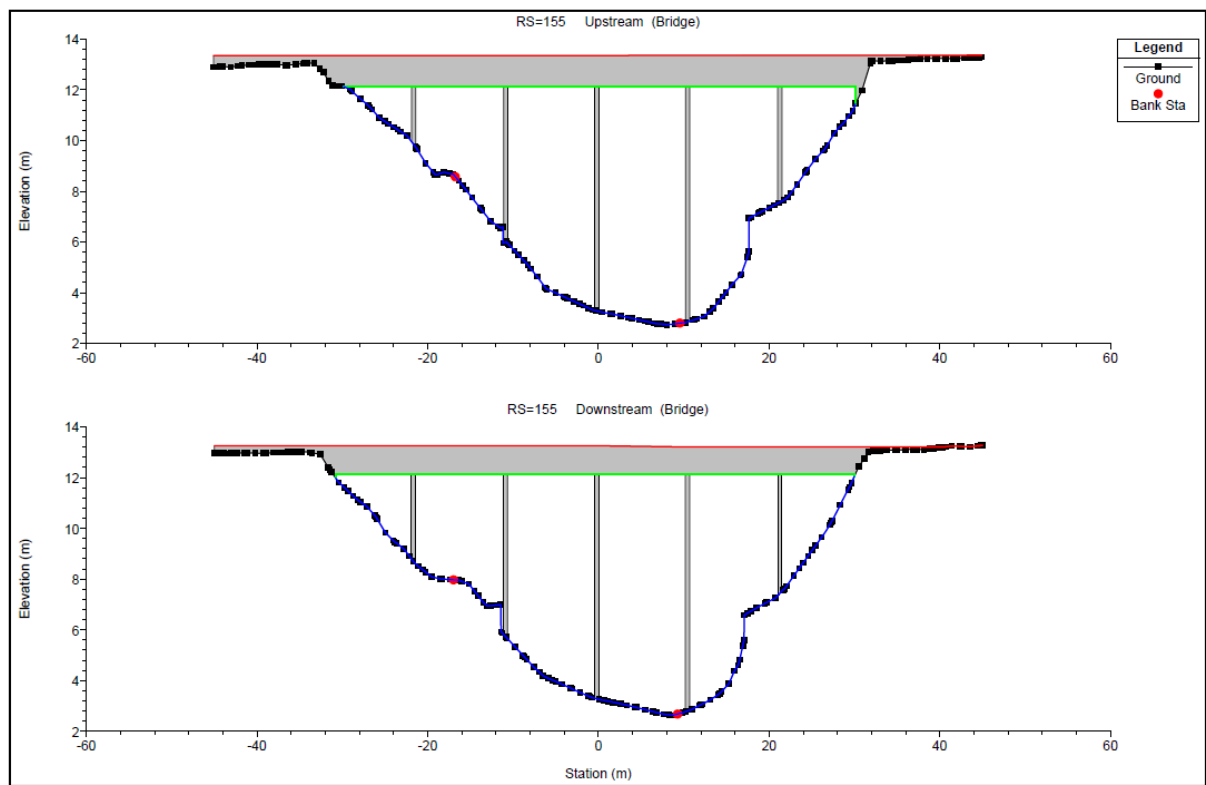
Westmead Hospital Access Road Bridge Section in HEC-RAS model
